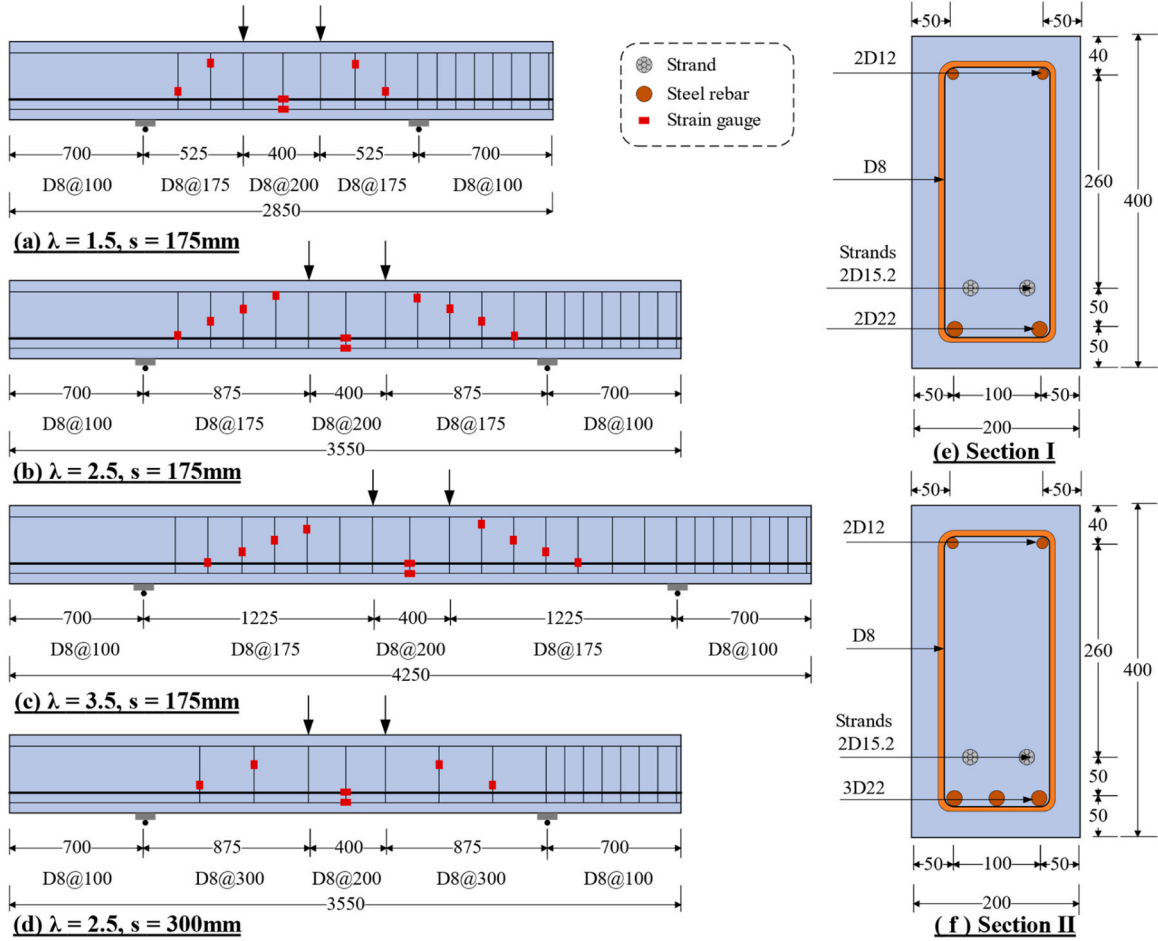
Configuration and reinforcement details of specimens (unit: mm).
